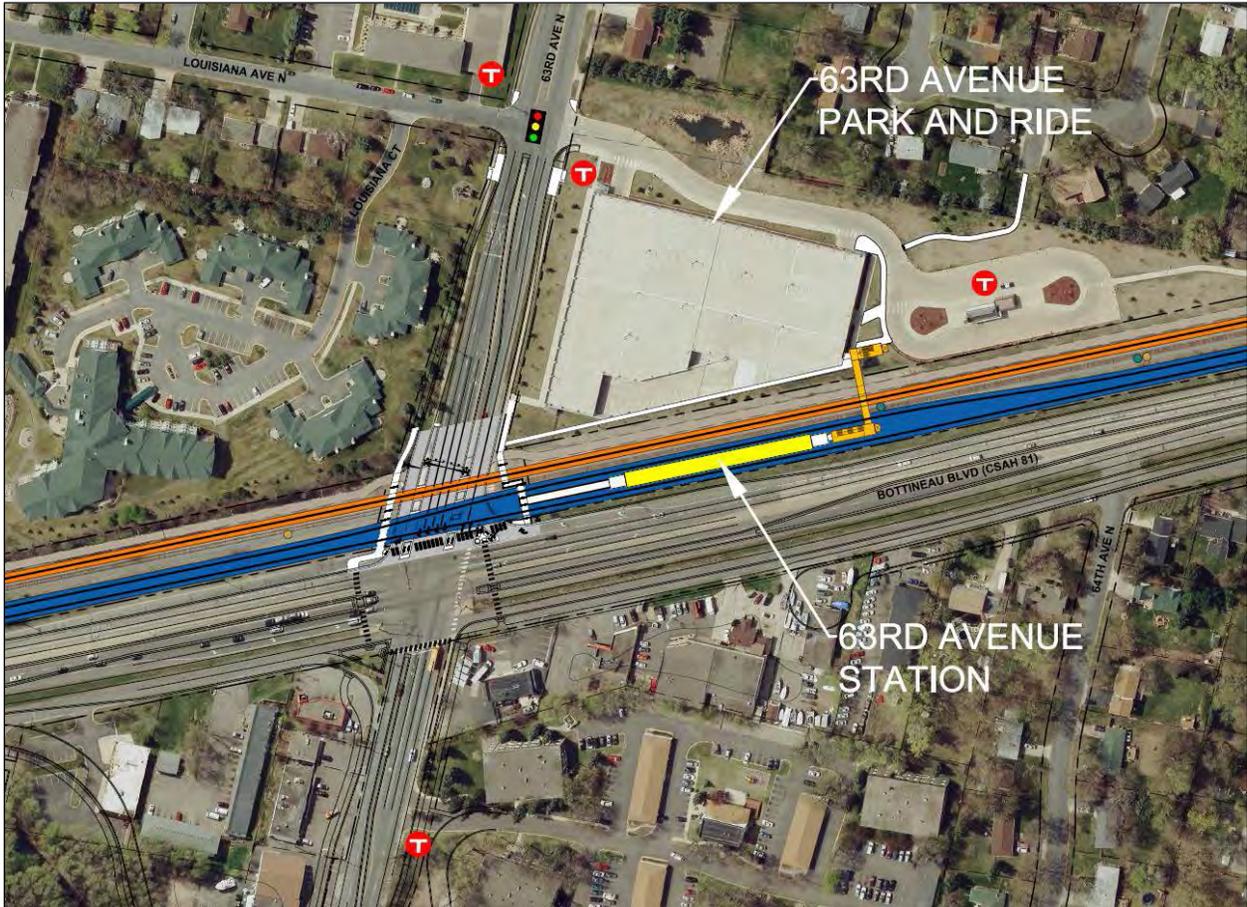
Proposed BLRT Extension Project Park-and-Ride Locations – continued
